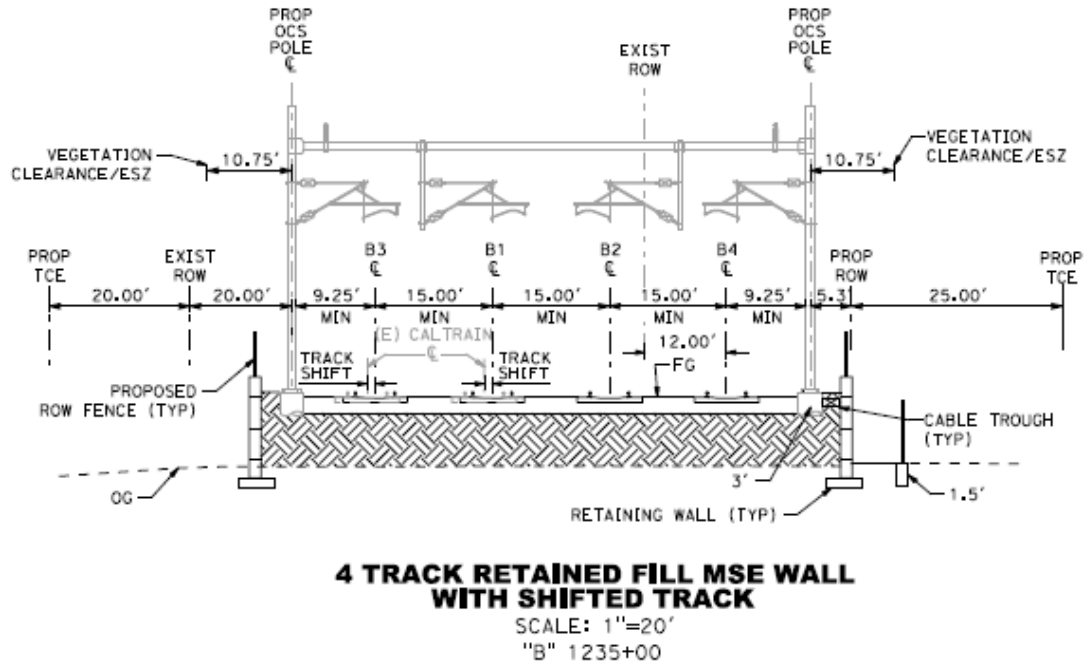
Typical Section - San Mateo to Palo Alto Subsection Alternative B
